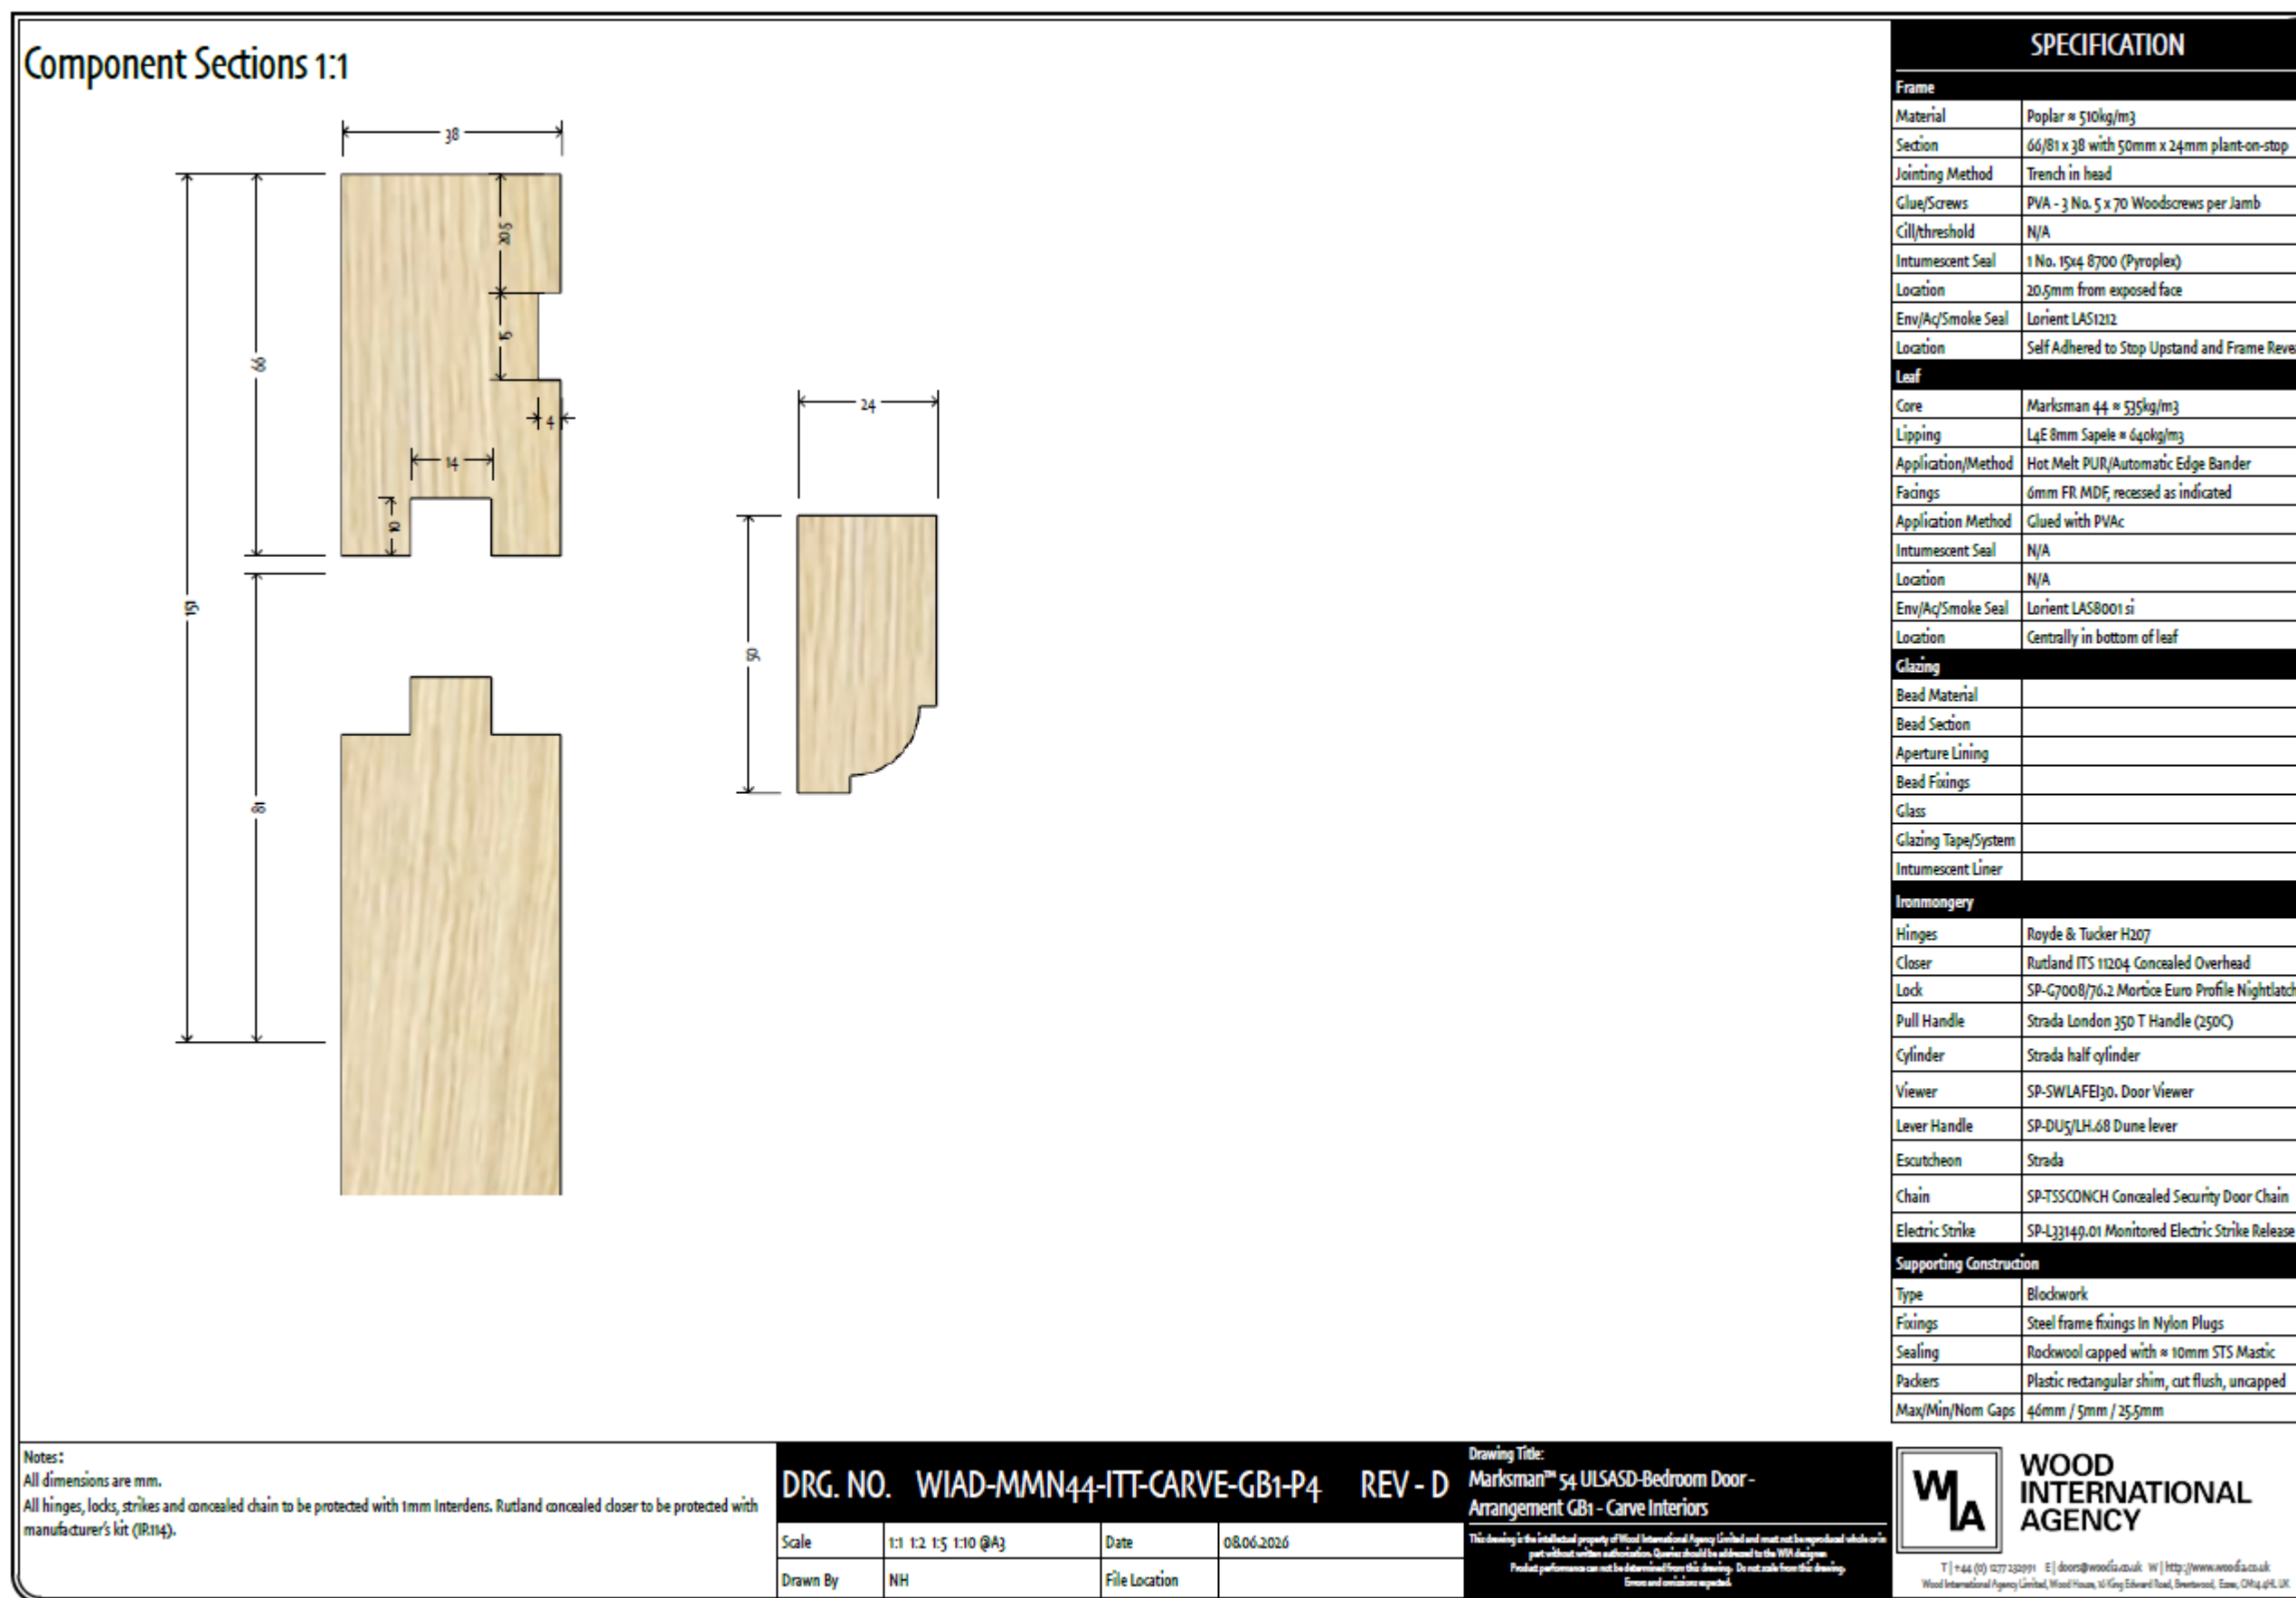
Doorset B - Drawing No. WIAD-MMN44-ITT-CARVE-GB1-P4 Page 4
